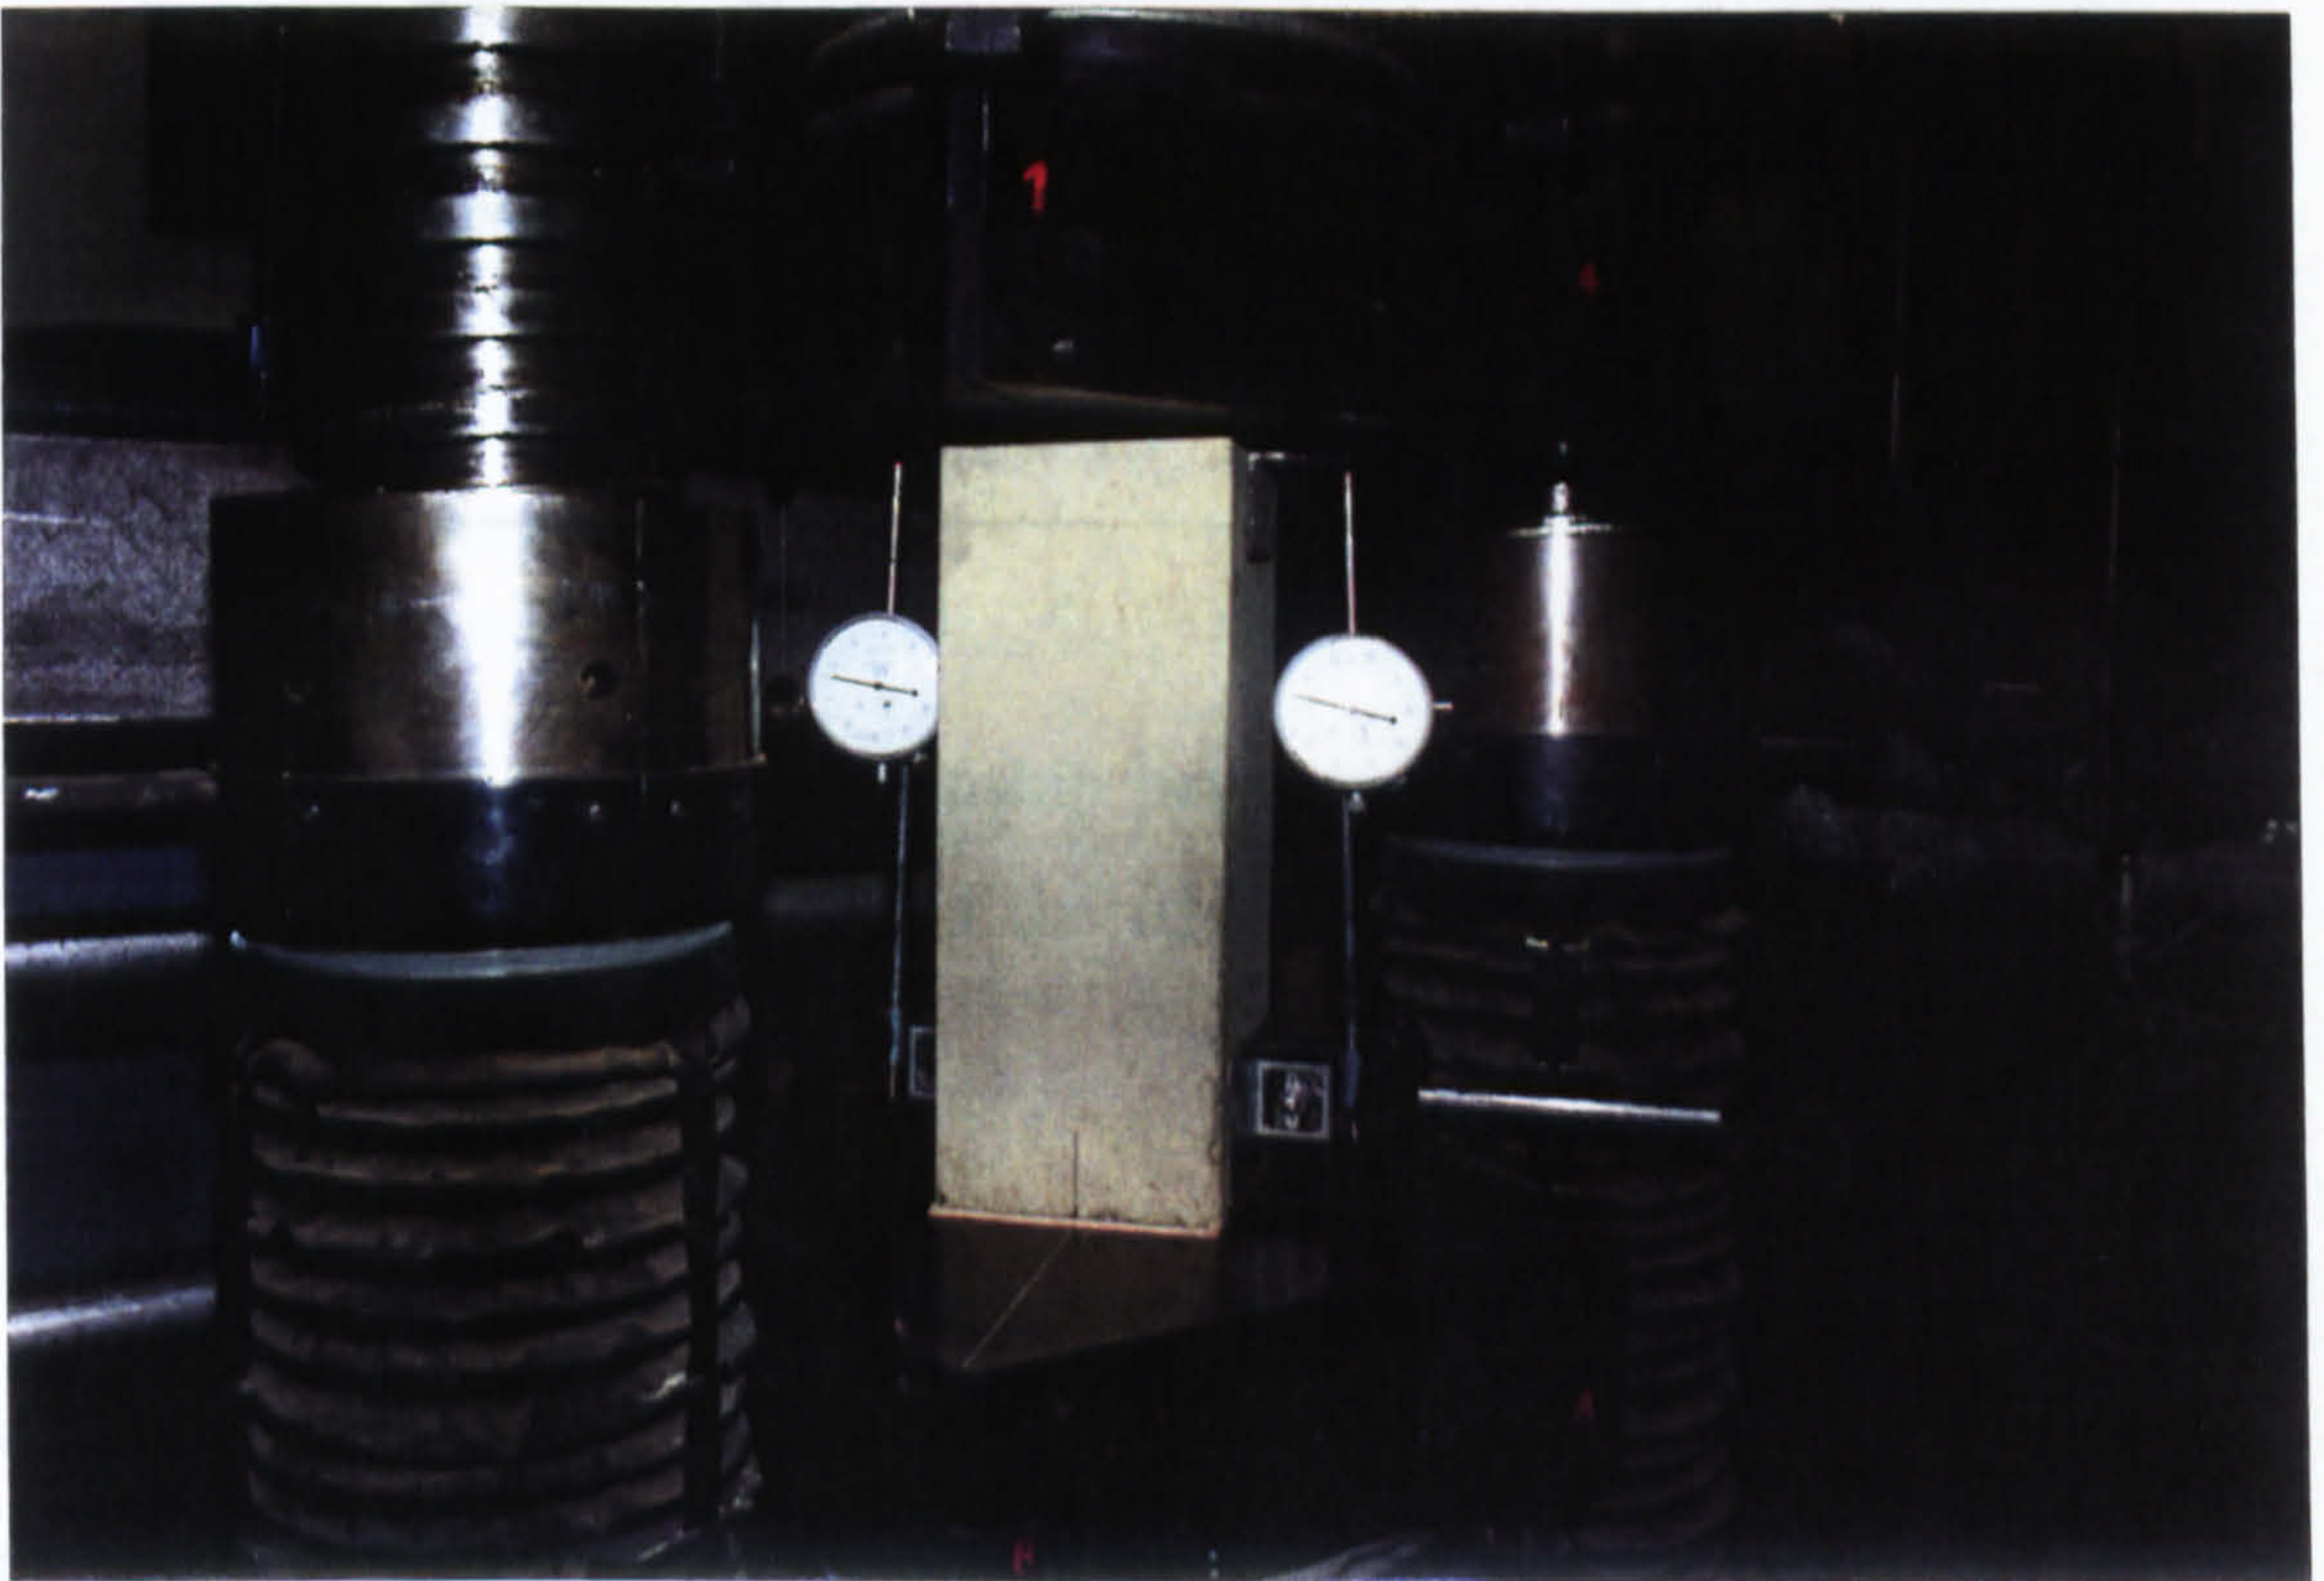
Compression test of concrete column to determine its Young's modulus of elasticity
